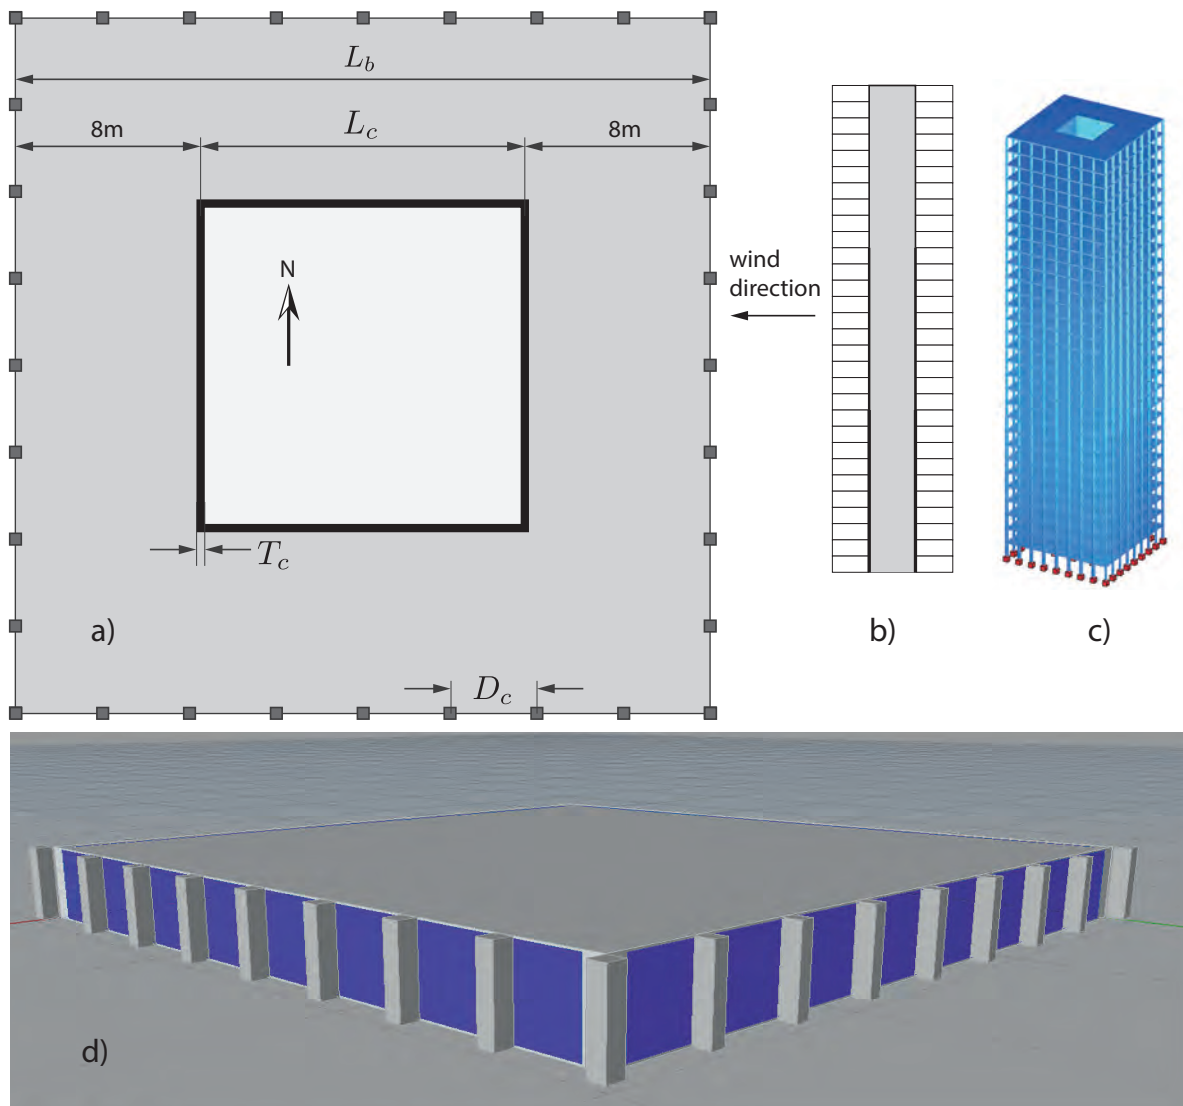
a) Typical floor plan, b) Section view, c) Sofistik model, and d) Rhino/Grasshopper model
